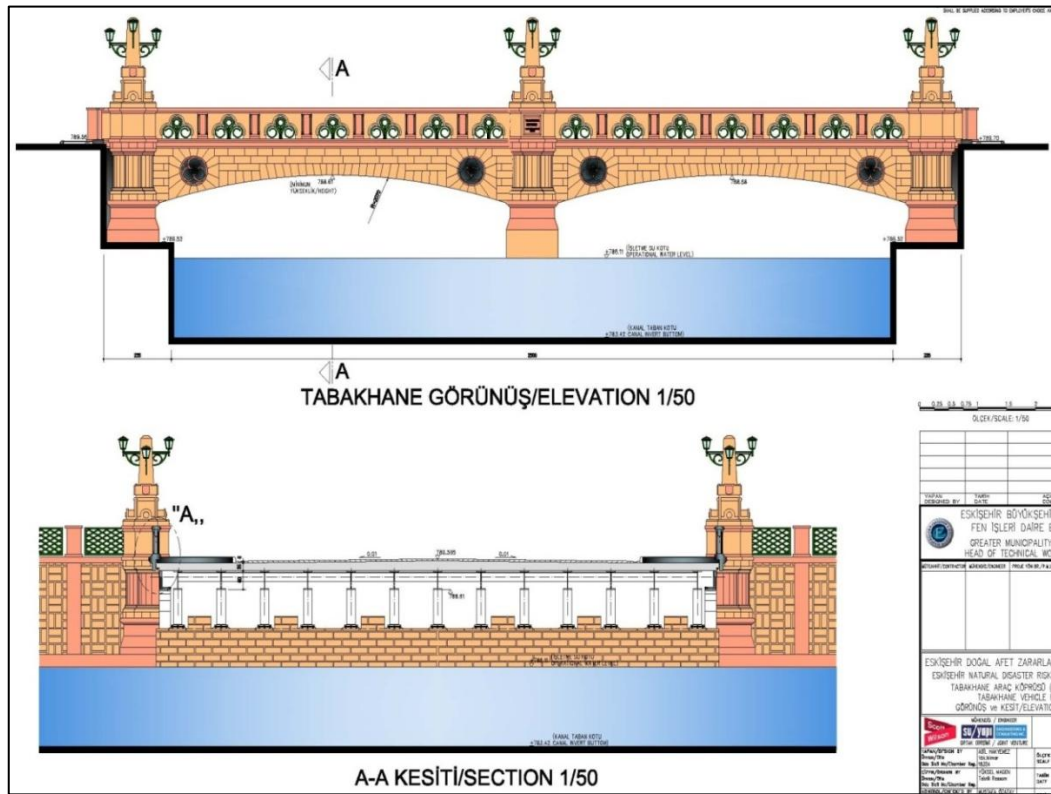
Elevation and Cross Section of Tabakhane Bridge
